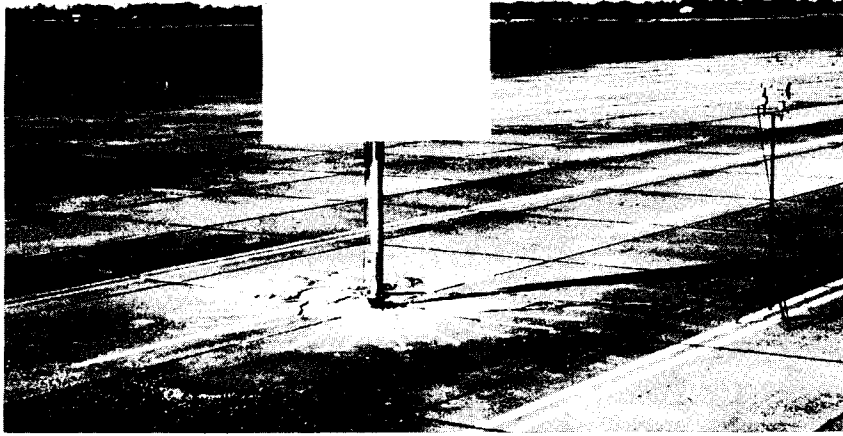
FULL-SCALE SIGN ON TEST SITE
